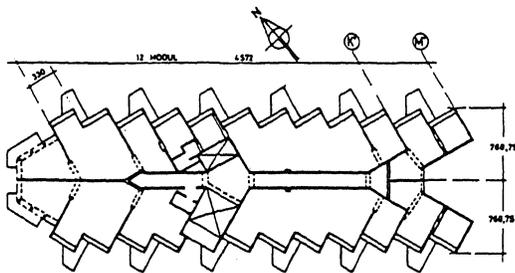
Acapulco building floor plan. Levels 2 to 6.
